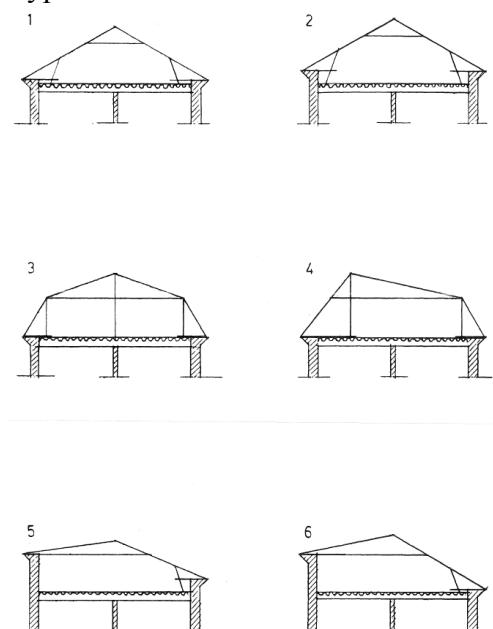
Typical designs of roof trusses for cold attics (Bjerking, 1974).
